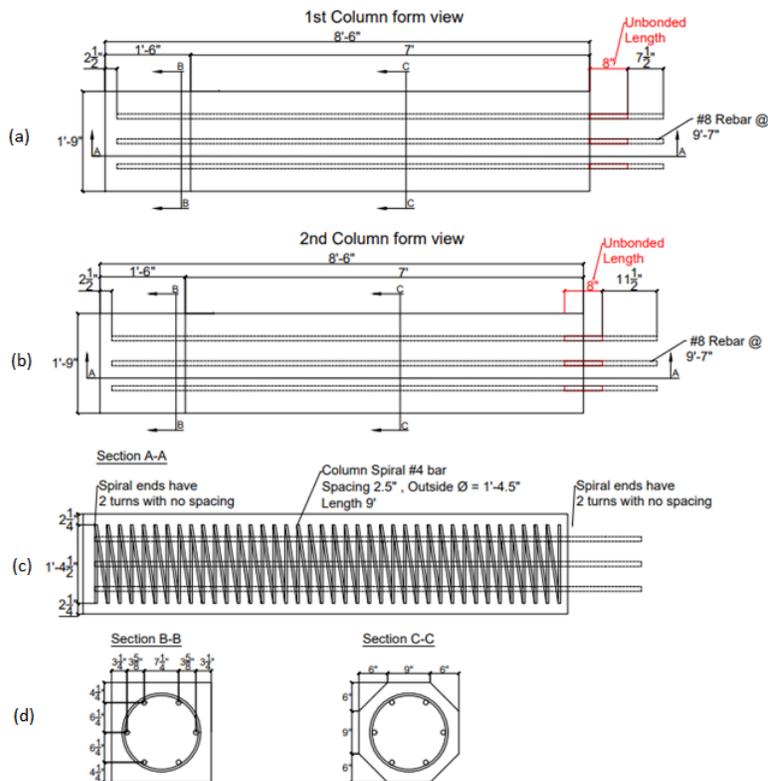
Column details: (a) Test 1 column; (b) Test 2 column; (c) Column reinforcing details; (d) Column cross-section.
